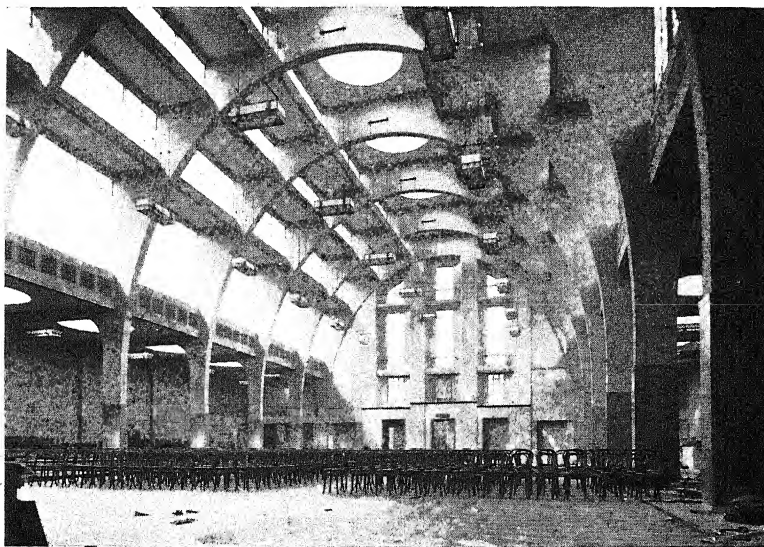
The reinforced concrete structure of the Hall of the Royal Horticultural Society, London, by J. Murray Easton and Howard Robertson.
